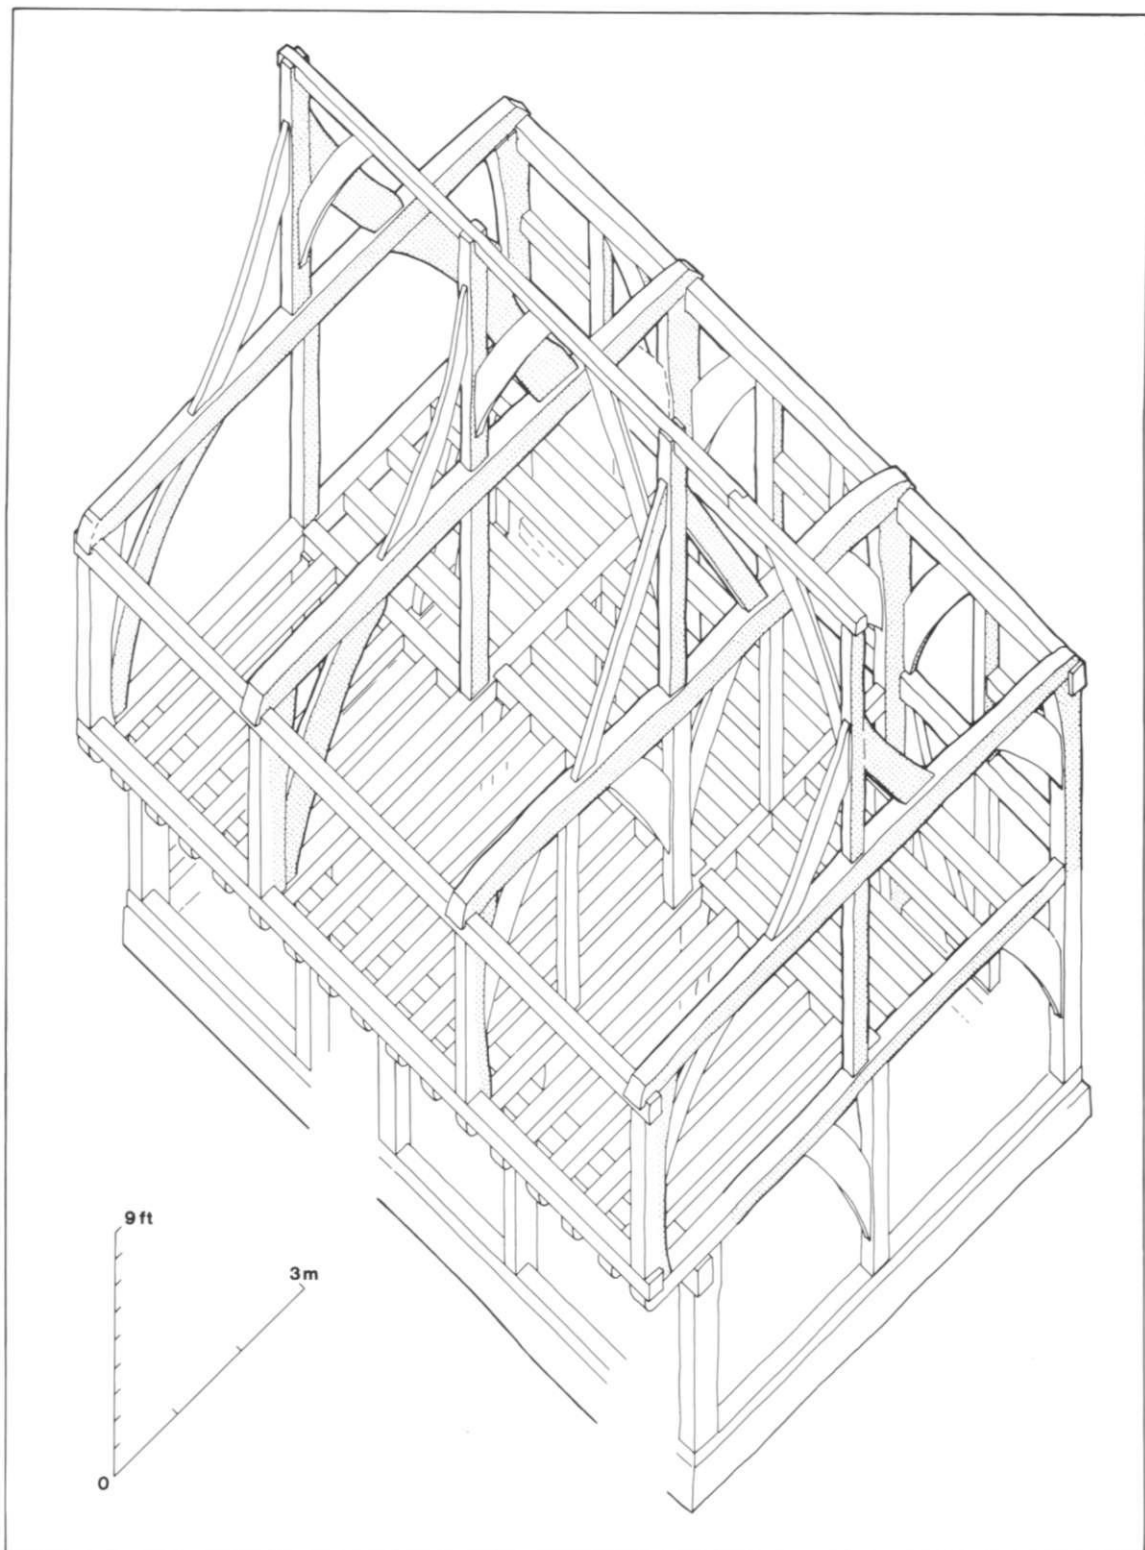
186, Horninglow Street: reconstruction drawing of medieval timber frame.
